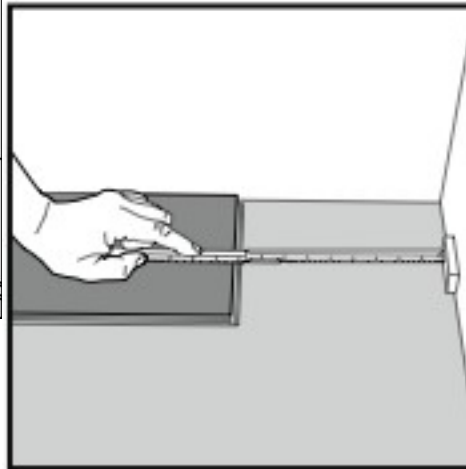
At the end of the first row, measure and cut the final plank to the correct length, leaving a 5/16" (8mm) gap between the plank and the wall for expansion. The recommended minimum length of the plank.
